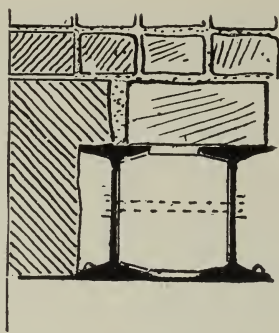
Two I-Beams Supporting Stone Lintel, Wall and Joists; Three-eighths-inch Steel Plate Rivetted to Beams.
